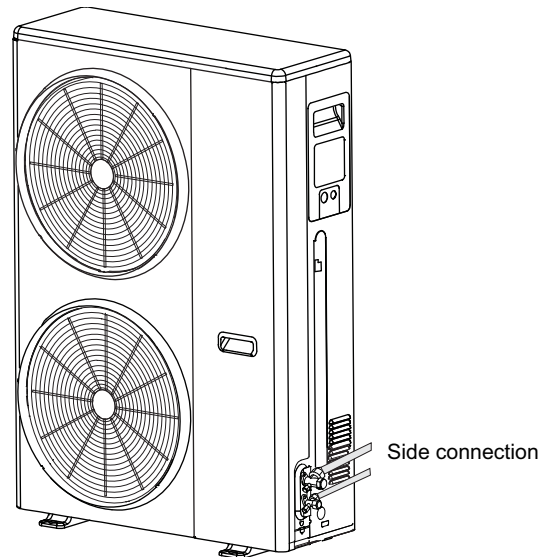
Connection of Flaring (4.0/5.0 ton) - Front View
